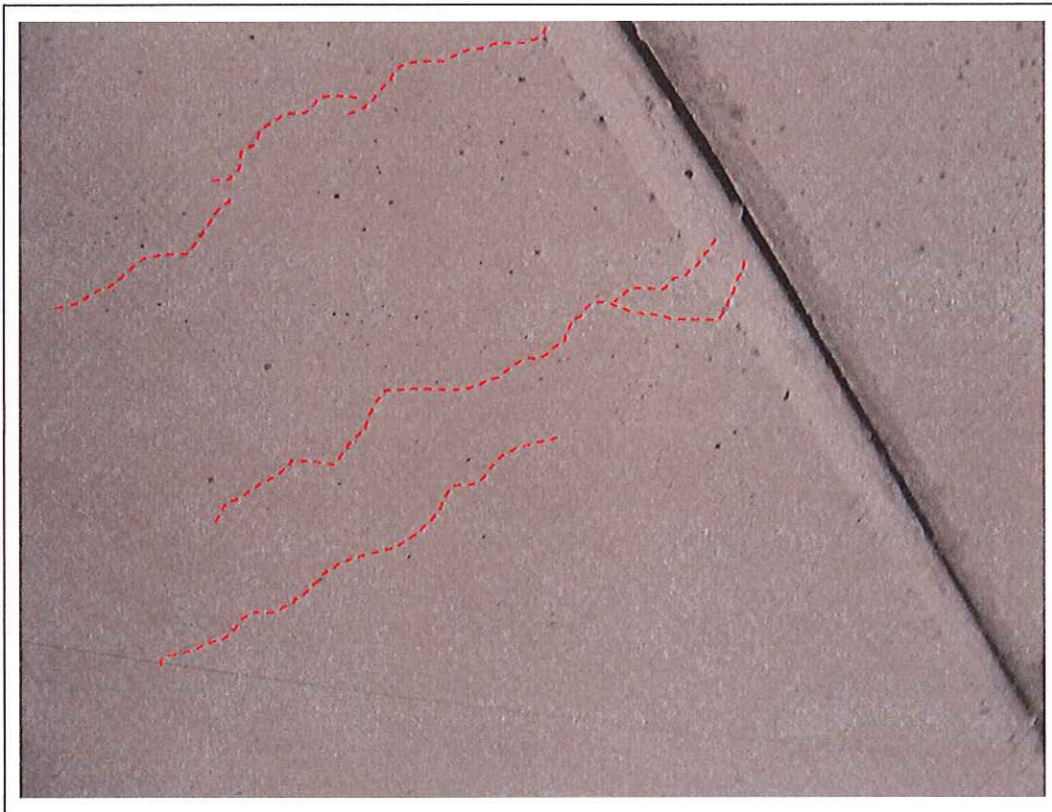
Detail of cracking (bottom of the 2nd floor slab)
